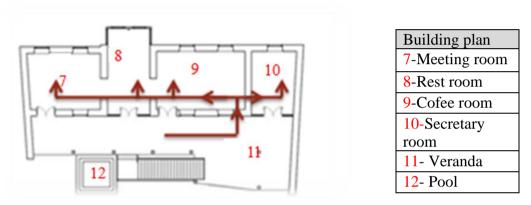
First floor plan of the Lusignan House (Author, 2015, based on Department of Antiquities and Museums original drawings) the building is not accessible at the present time.
